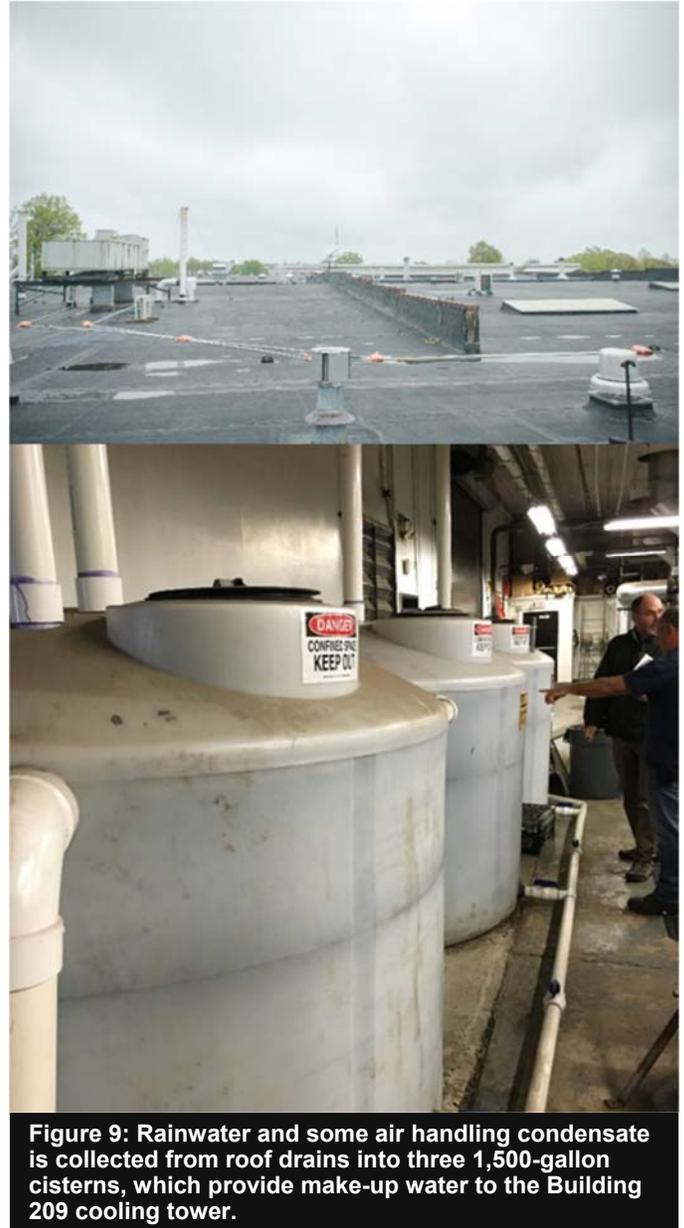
Rainwater and some air handling condensate is collected from roof drains into three 1,500-gallon cisterns, which provide make-up water to the Building 209 cooling tower.
